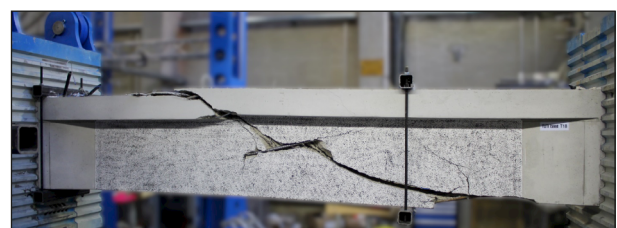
T-shaped cross-section T18 after final shear failure in the substructure setup
